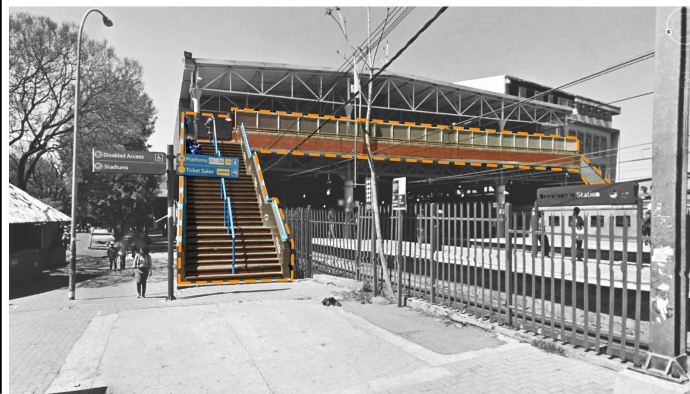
Site analyses - Station Access on the pedestrianised Currey street, providing access to station and Davies street (Author, 2019)
